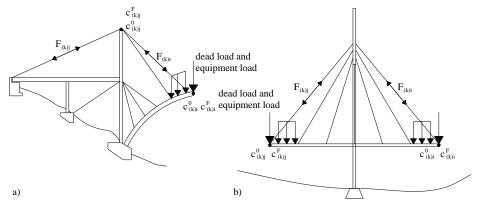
Partial elastic scheme with static constraints: a) arch bridge, b) cable-stayed bridge
